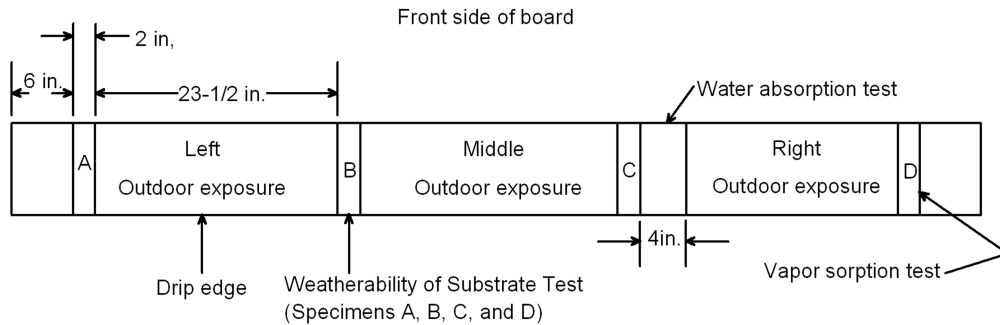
Diagram for cutting specimens from 8 ft (2.4 m) pieces.
